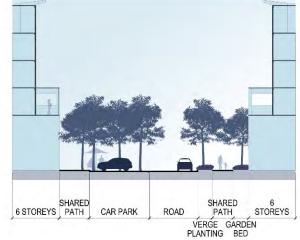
Daly Street (Plan Extract and Indicative Section)
